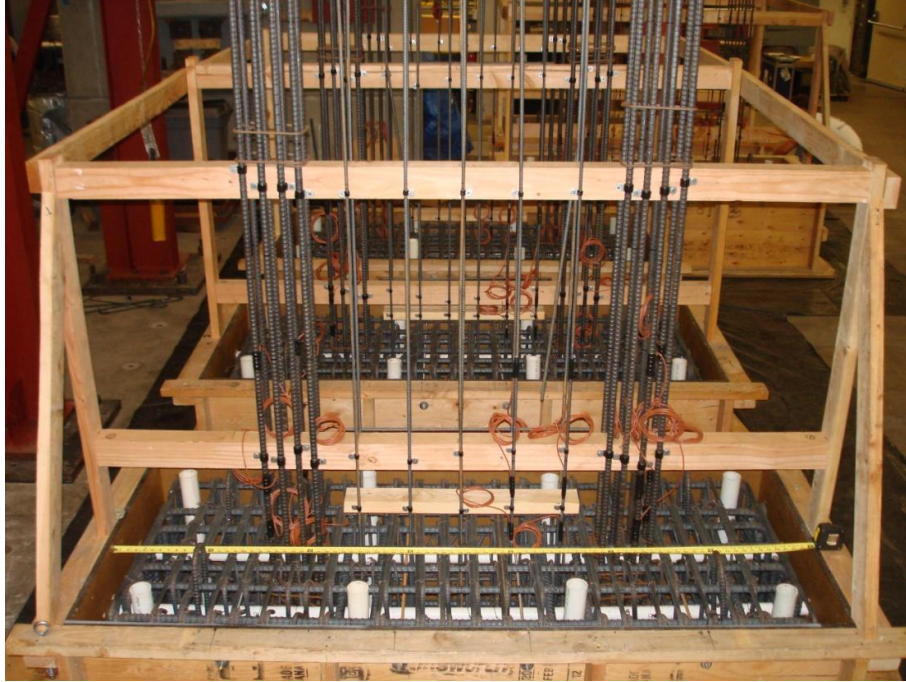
Fabricating boundary longitudinal and web vertical reinforcement
